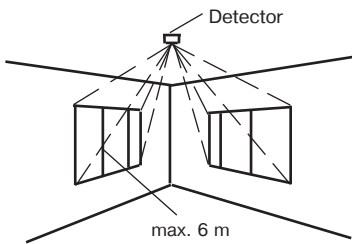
Installing the Detector on the Ceiling (for window openings in the neighboring walls monitoring)
